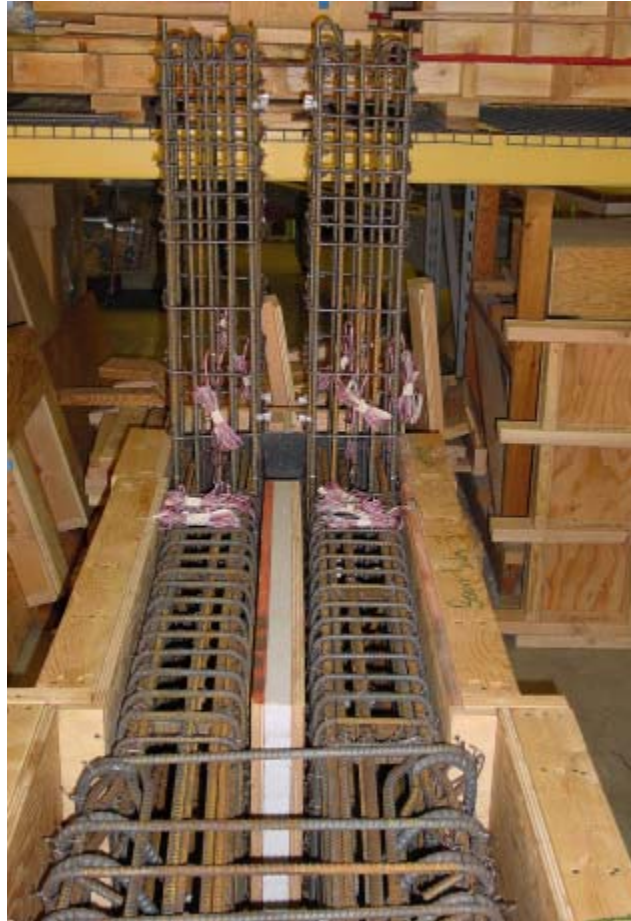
Retrofitted Split Long Outrigger Specimen Prior to Column Forming
